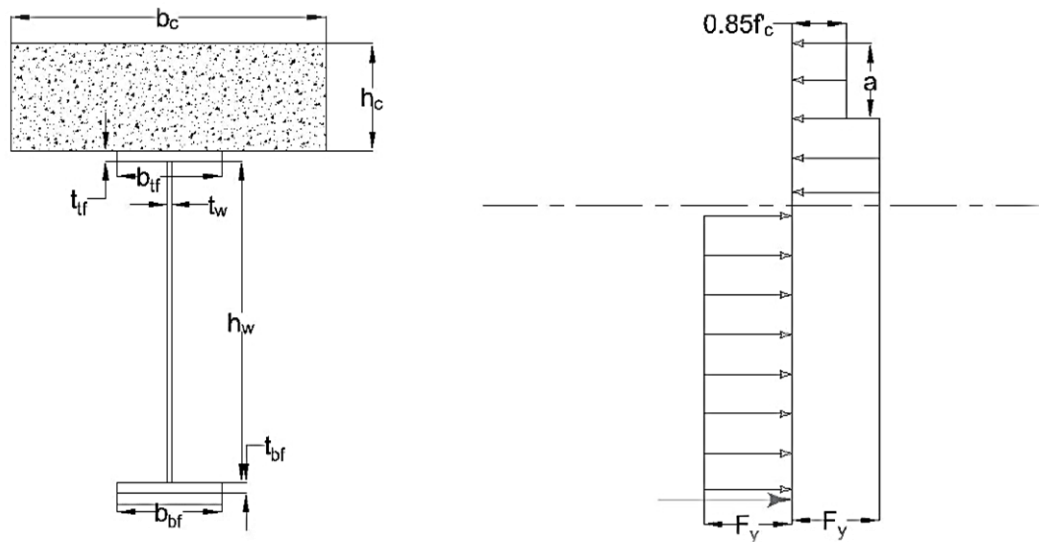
3 composite beam concrete and steel built up I section with cover plate at bottom flange
